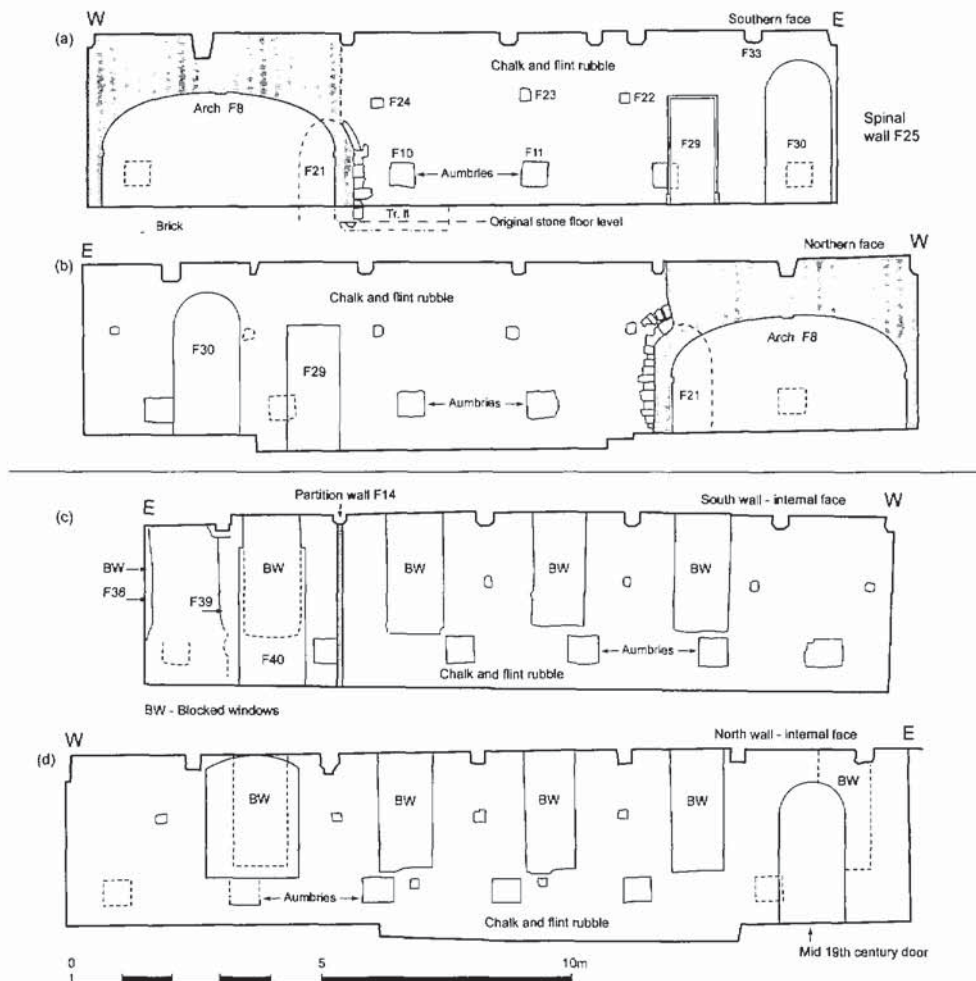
St John's Hospital – (a) spinal wall F25 – southern face (b) spinal wall F25 – northern face (c) south wall – internal face (d) north wall – internal face
